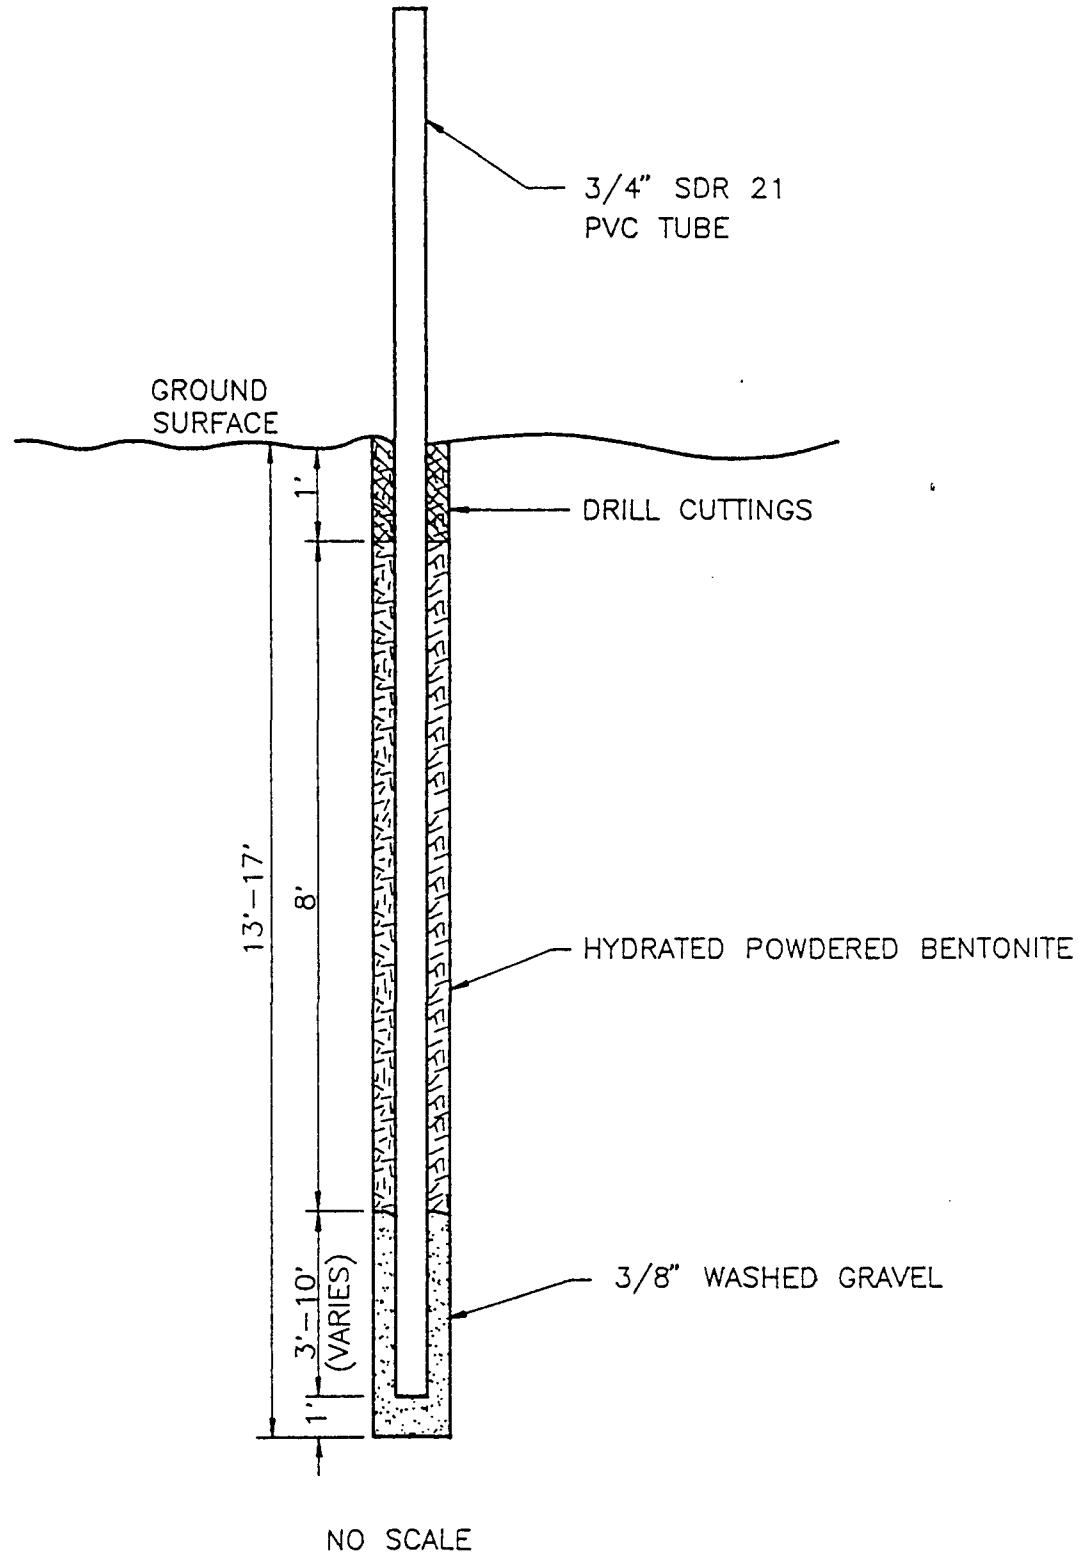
TYPICAL PIEZOMETER CONSTRUCTION FOR VACUUM MONITORING POINT
